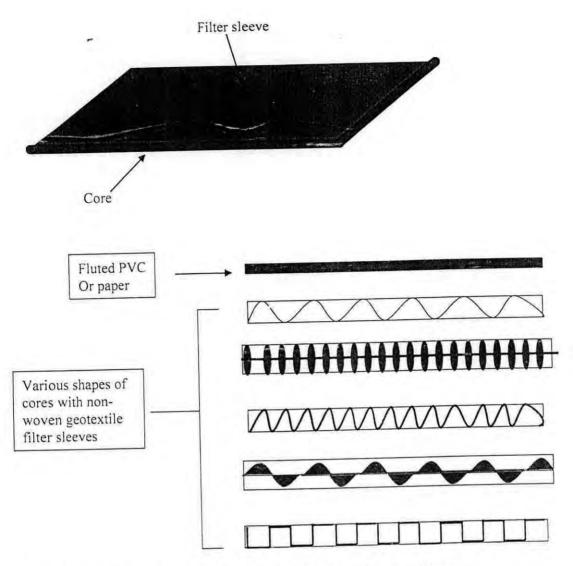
Typical Core Shapes of Synthetic (Band Shaped) Drain.
